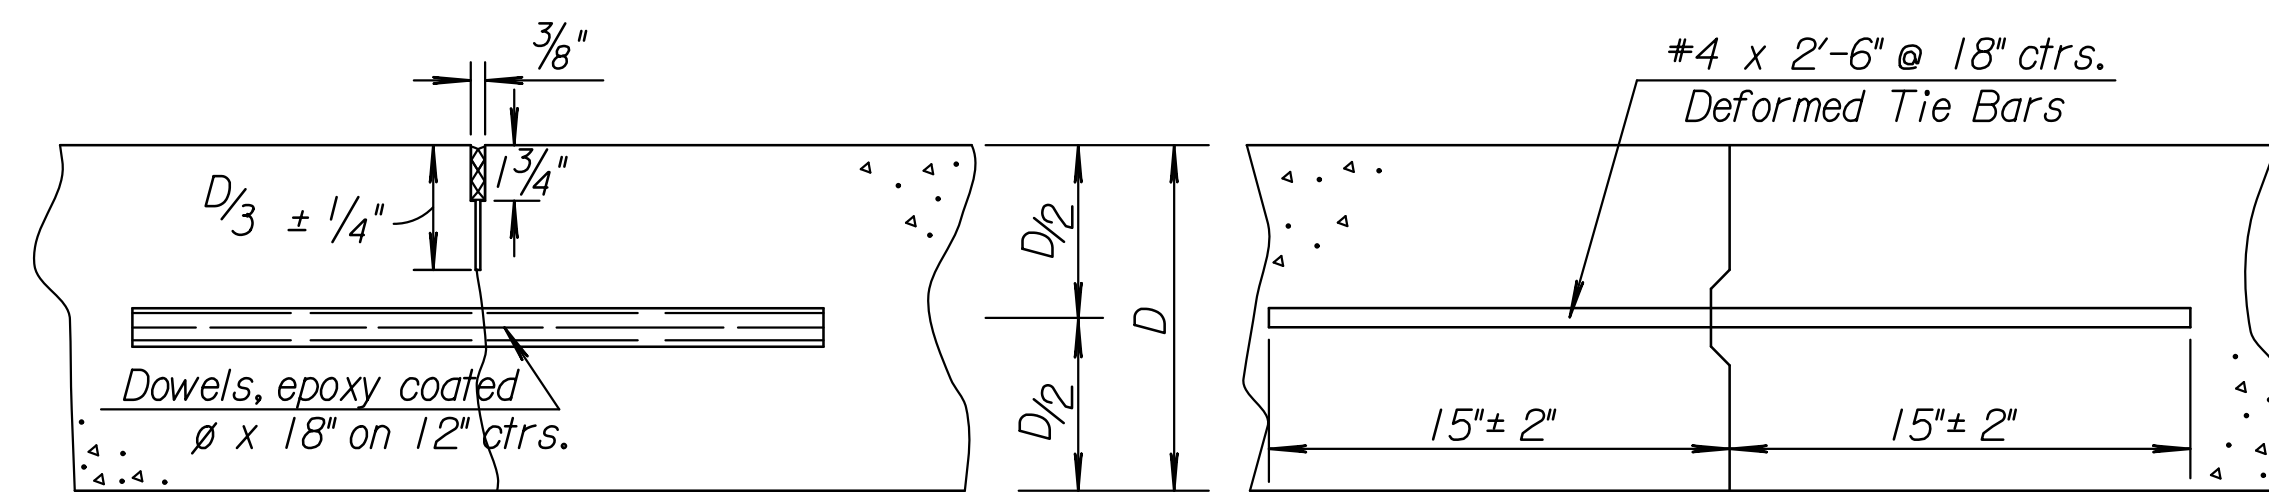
DETAIL OF SEALED CONTRACTION JOINT SAWCUT
